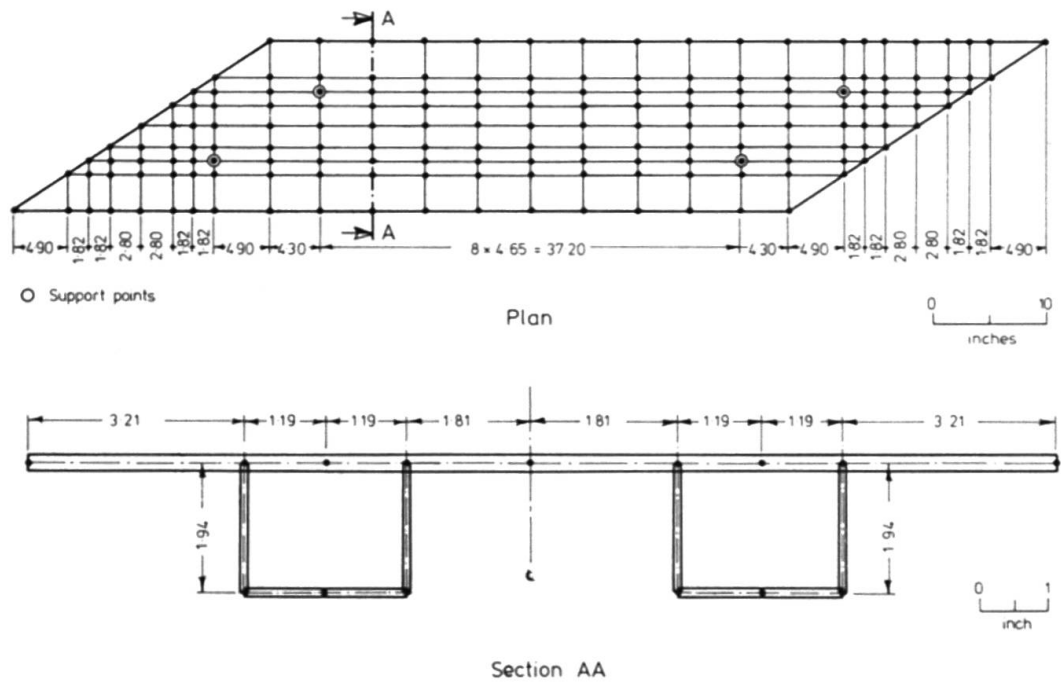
Composite twin cell box girder bridge model. Finite element idealization
